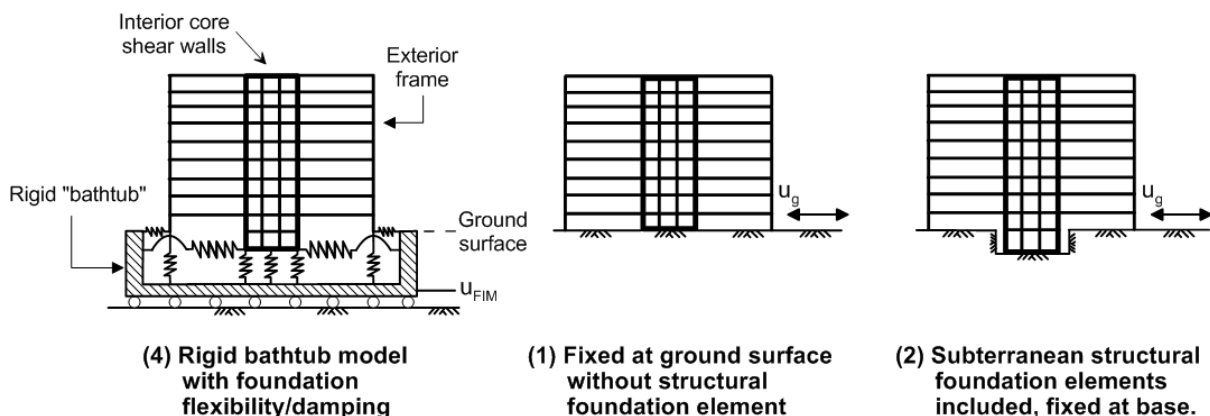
Schematic illustration of modeling approaches for the Walnut Creek building.
